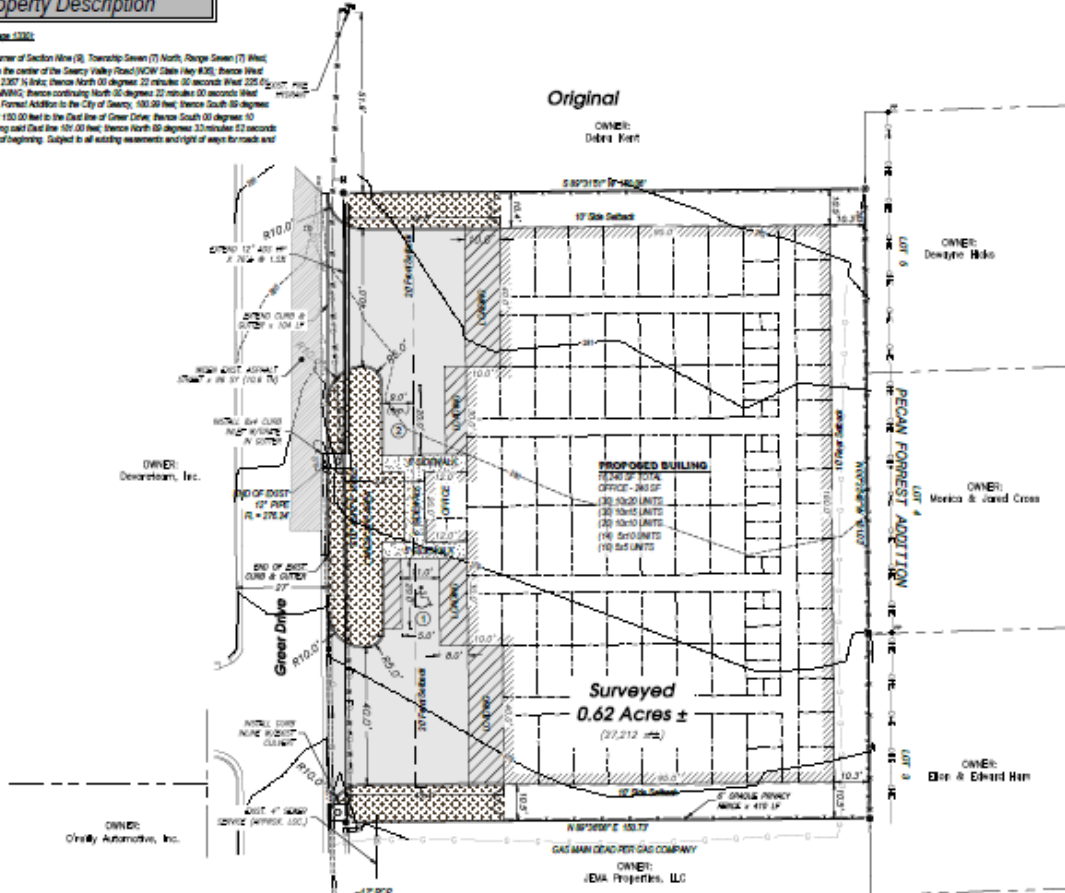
EXHIBIT B (ZONING DEVELOPMENT PLAN):
